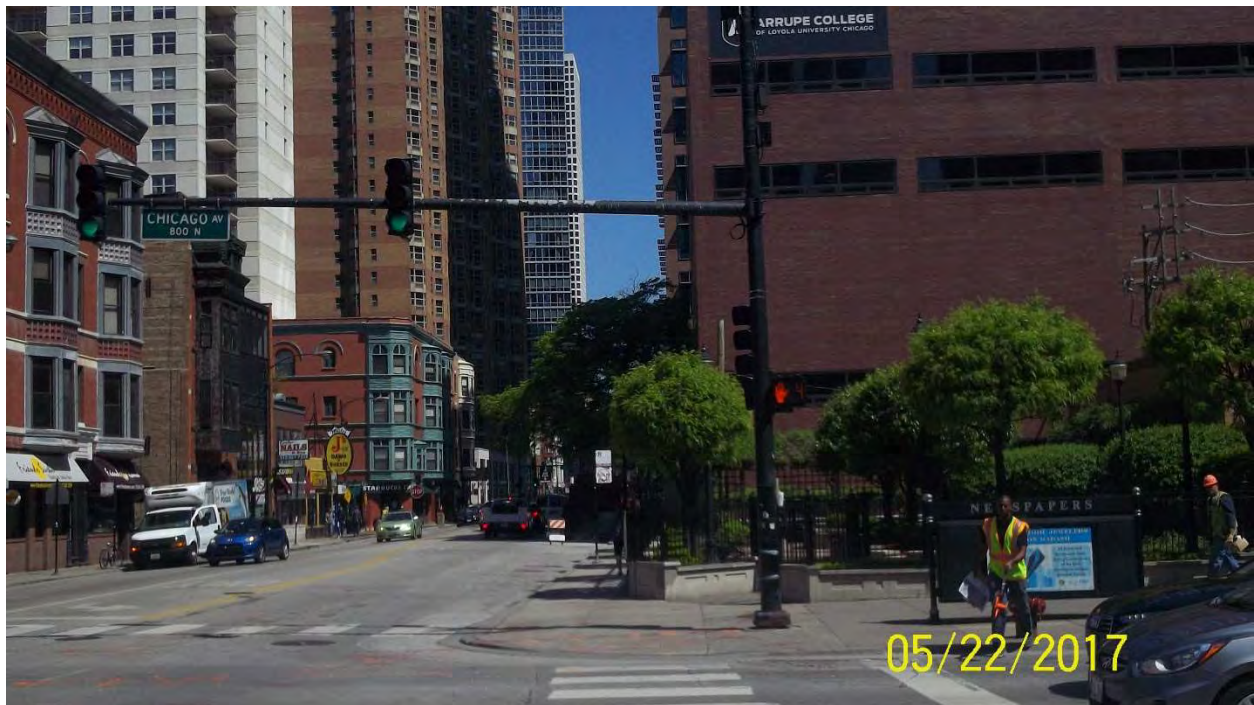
Southeast corner of Chicago Ave. / State St. – Looking North
